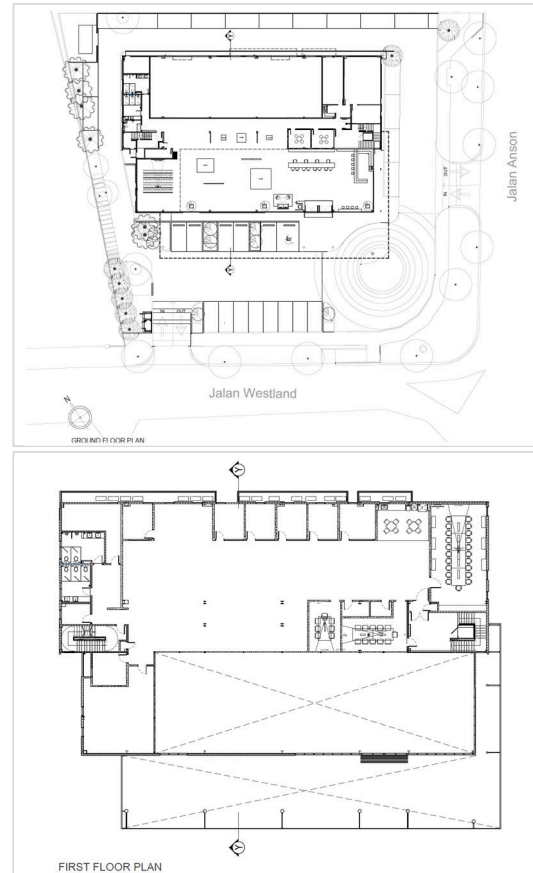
and 5. Show the ground floor and first floor plan of Sunway Sales Galley respectively
